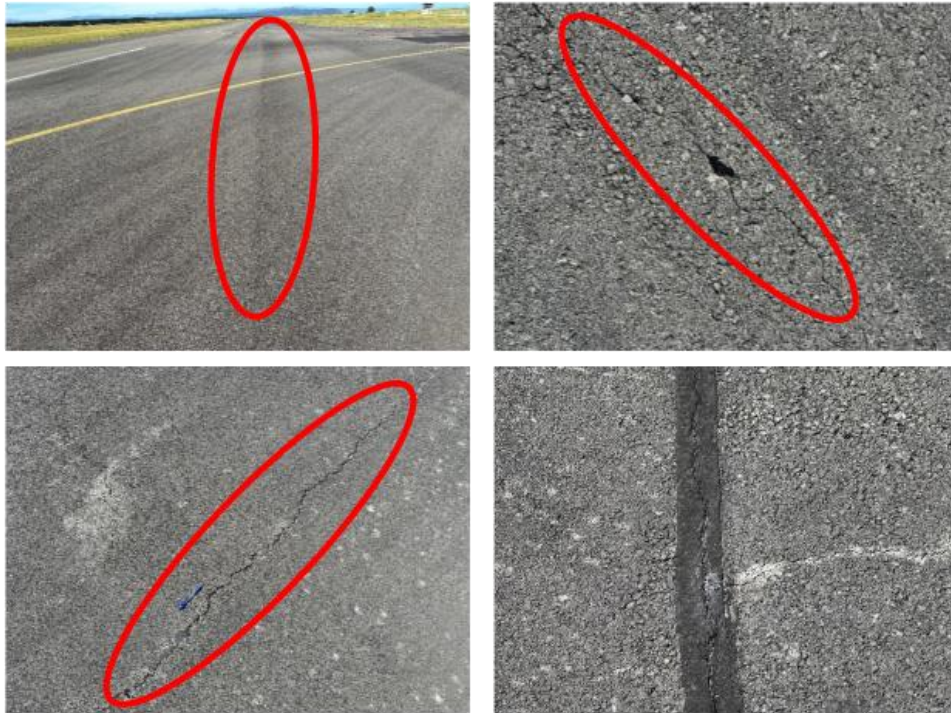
Main Runway – Longitudinal and Transverse cracking
